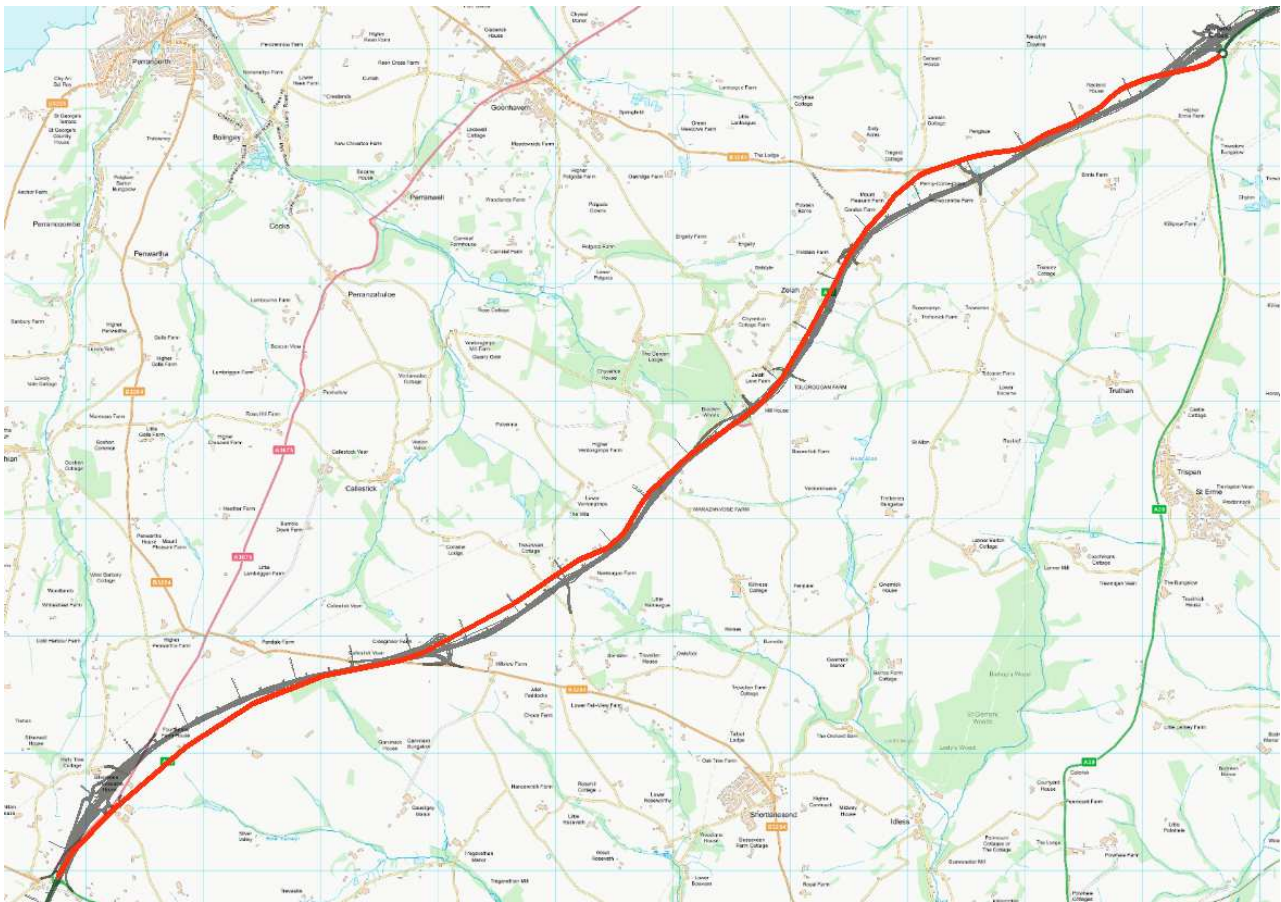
Arrangement of the new dual carriageway for the A30 (existing A30 shown in red)
